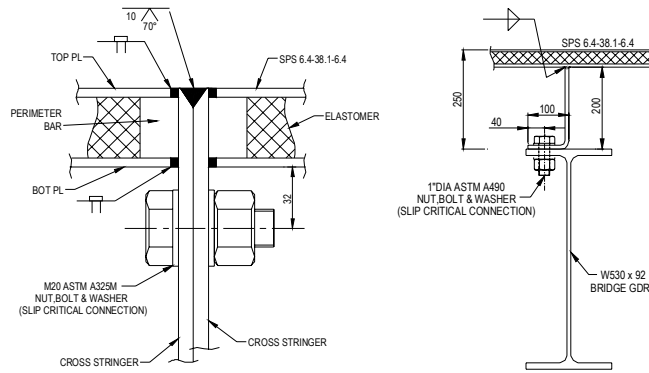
Typical Panel-to-Panel and Panel-to-Girder Connections
